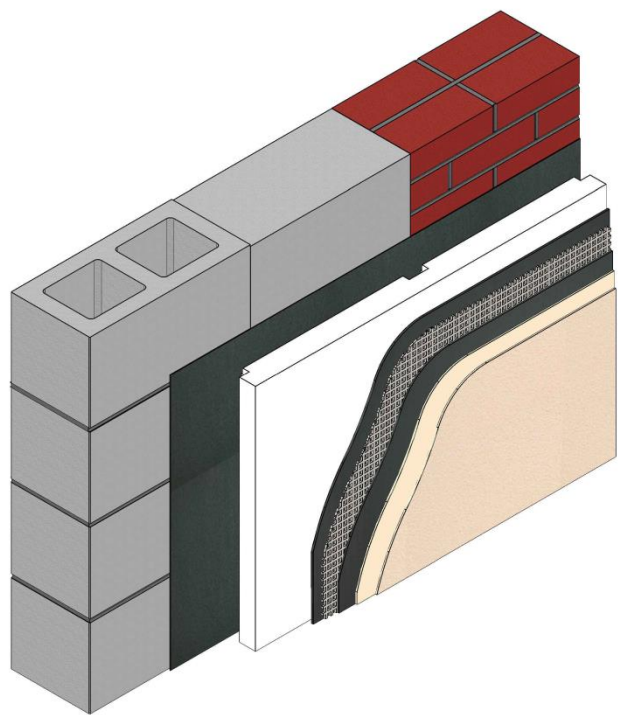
“Senerflex” over concrete, concrete masonry unit and masonry
